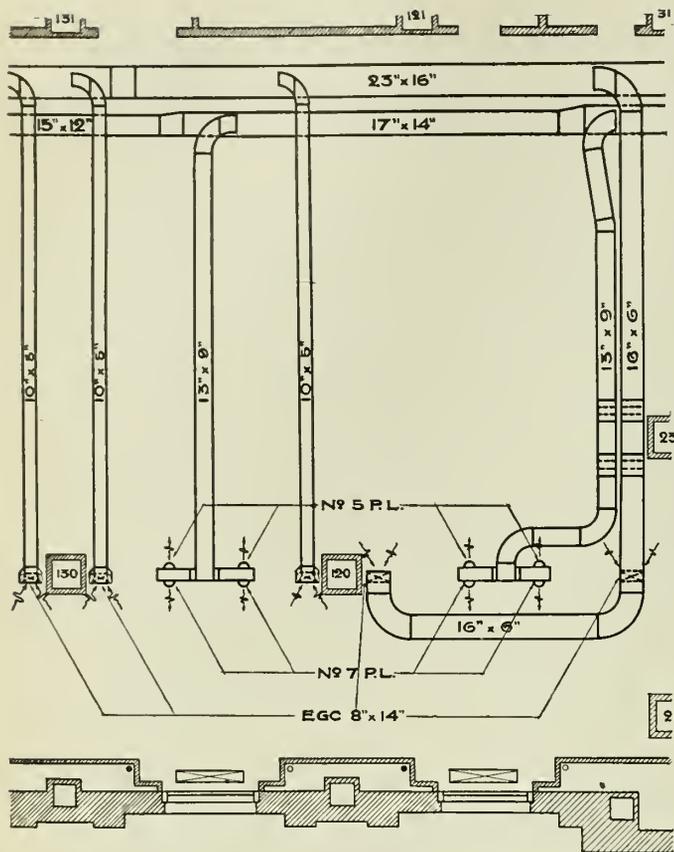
Part Plan of Typical Floor. Upper Zones.
